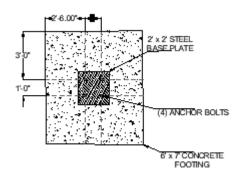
Detailed layout of the anchor bolt plate on the footing column.
